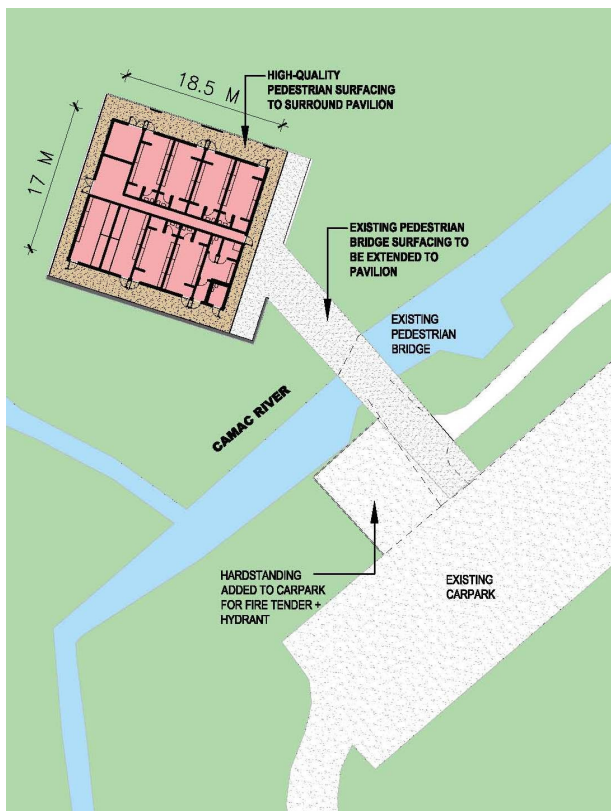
Proposed plan of pavilion sited across the existing pedestrian bridge from the carpark
